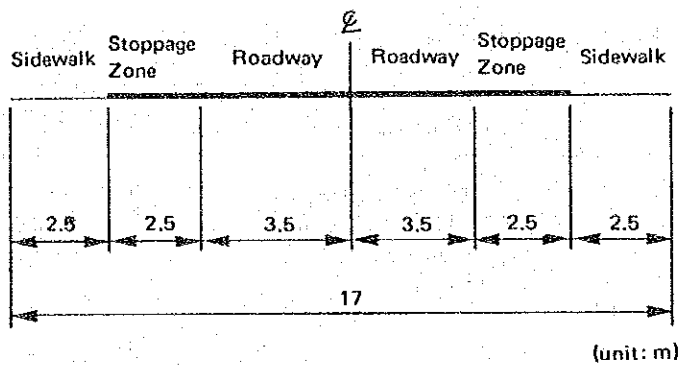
Cross Section of Port Roads (2 Lanes)
